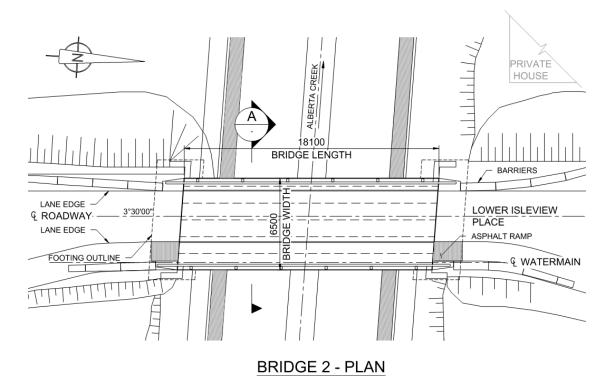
Isleview Place Bridge over Alberta Creek (Lower) – Plan
